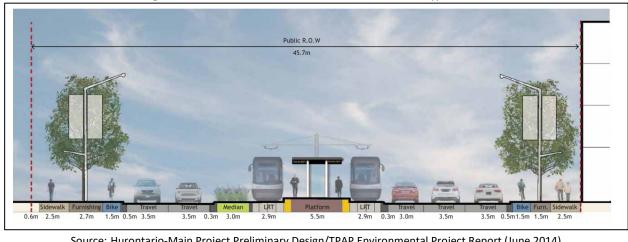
Future Hurontario Street Cross-Section at Courtneypark Drive
